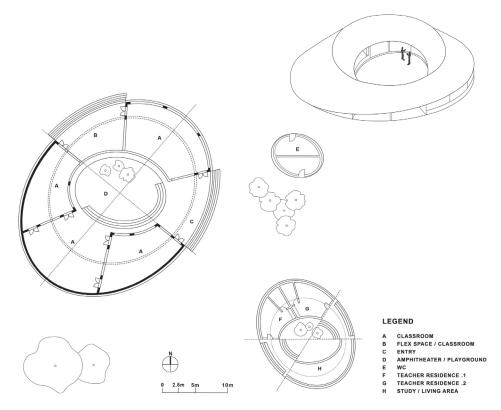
Primary School in Fass, Senegal. Ground floor layout of two buildings (elaborated by A. Karpińska based on [19])
